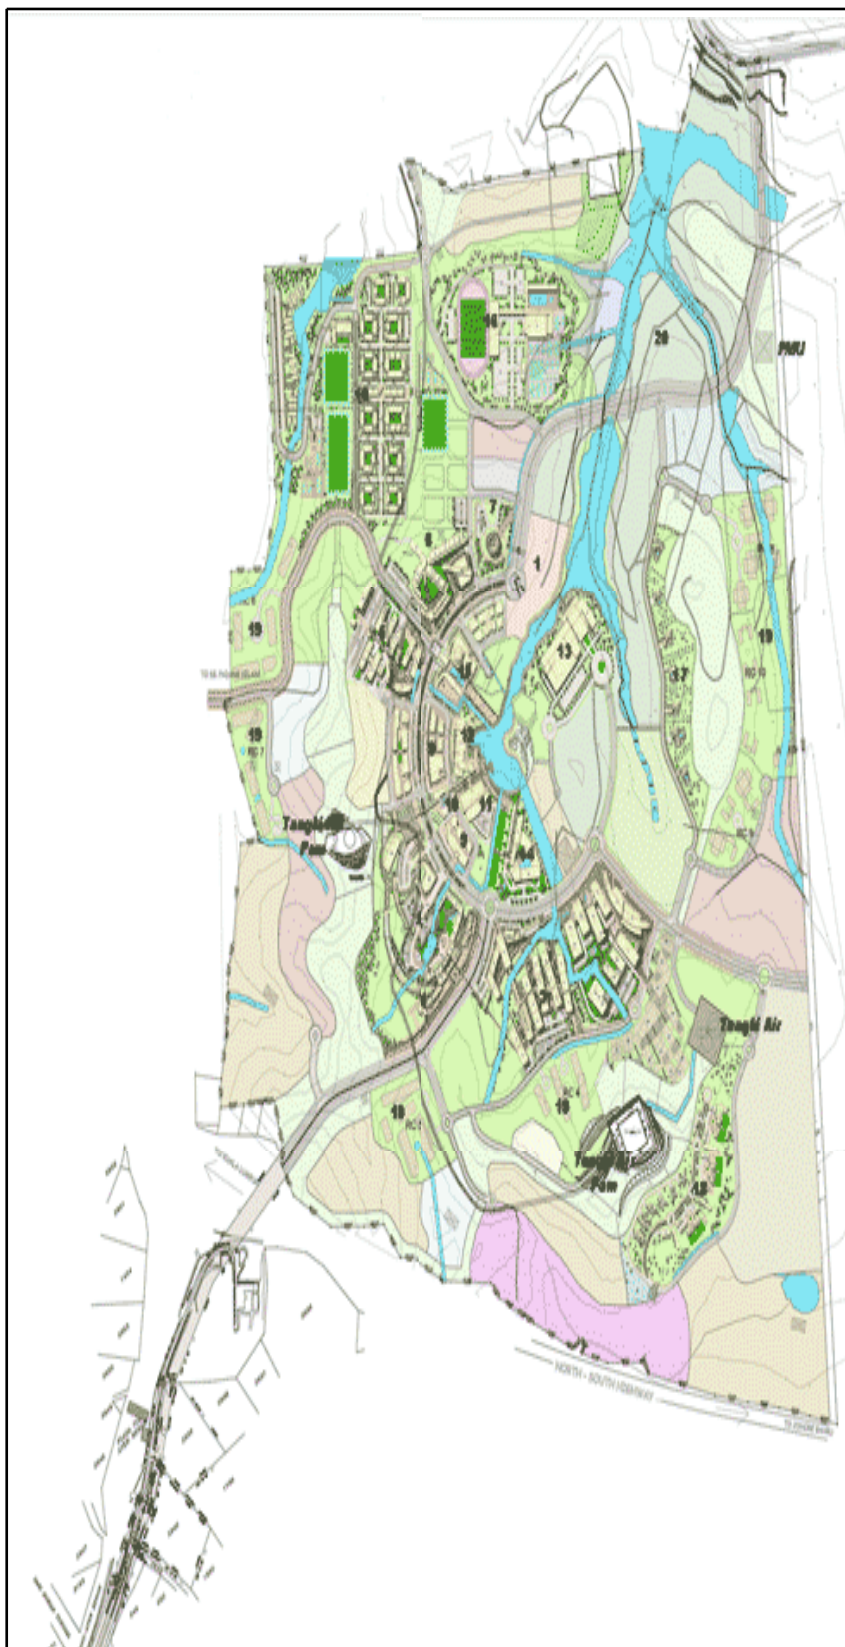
Master Plan of KUTKM Campus, Malacca
